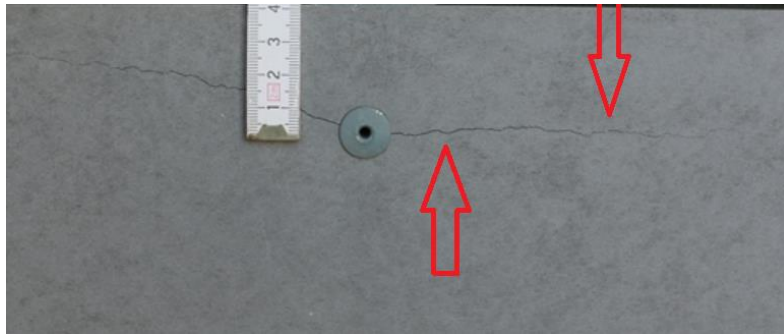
Damage to ventilated façade cladding (Author's photo)
